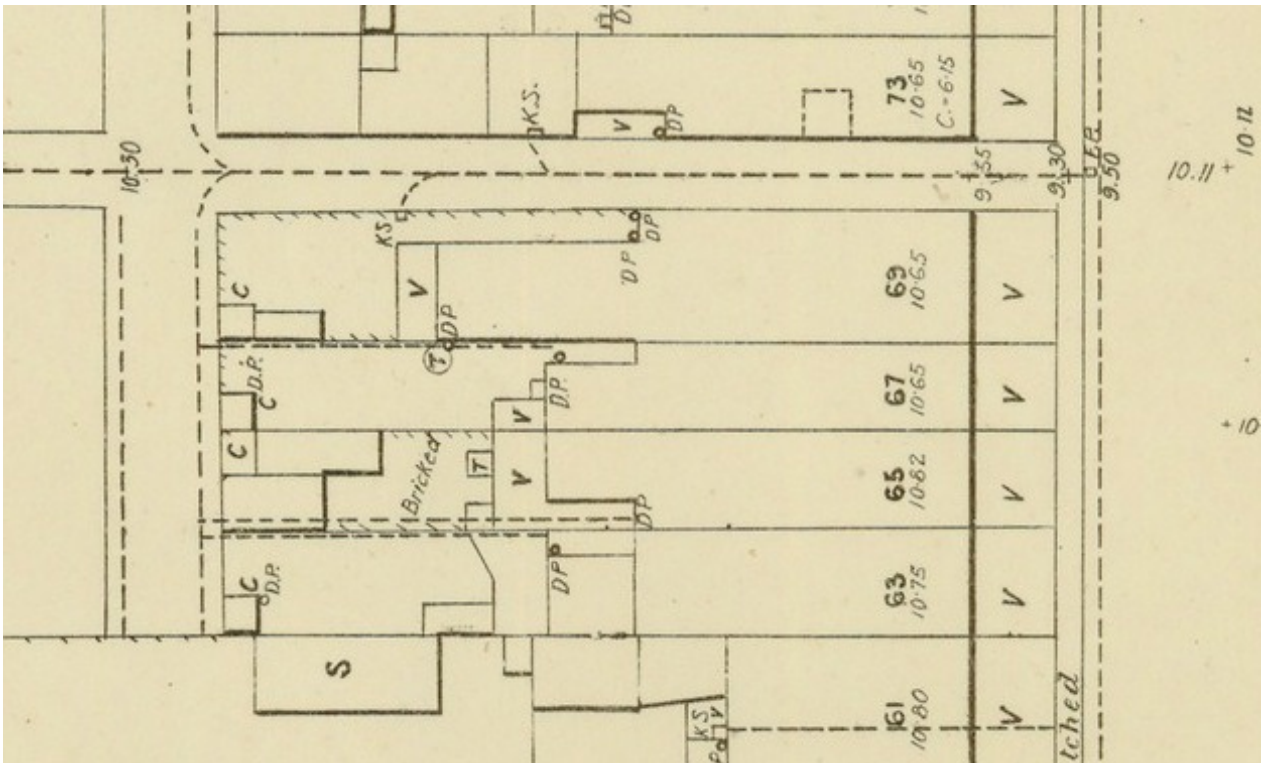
MMBW detail plan 328, Port Melbourne, 1895, showing the shops at 63-69 Bay Street (now 79-85).
